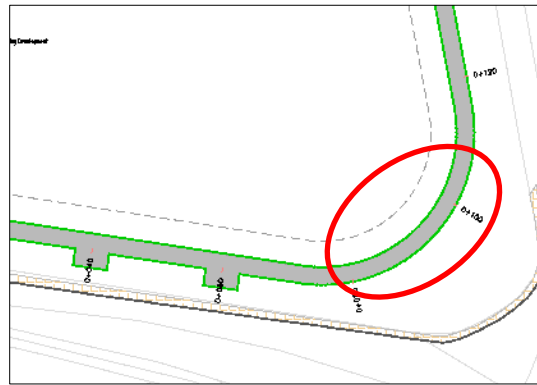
Old Lackanash Road/ Newtown Road – Inclined Slope
